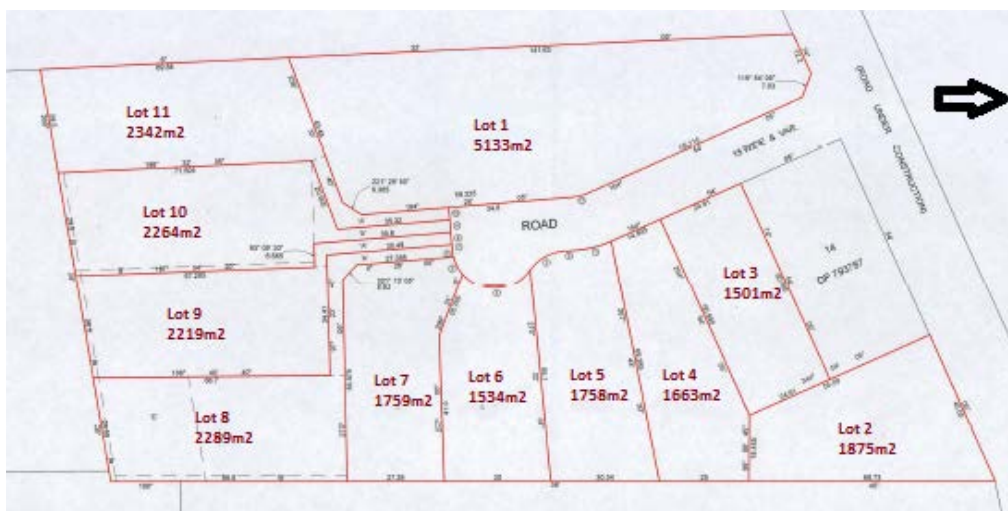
Proposed subdivision of 102 Hall Street, Pitt Town
